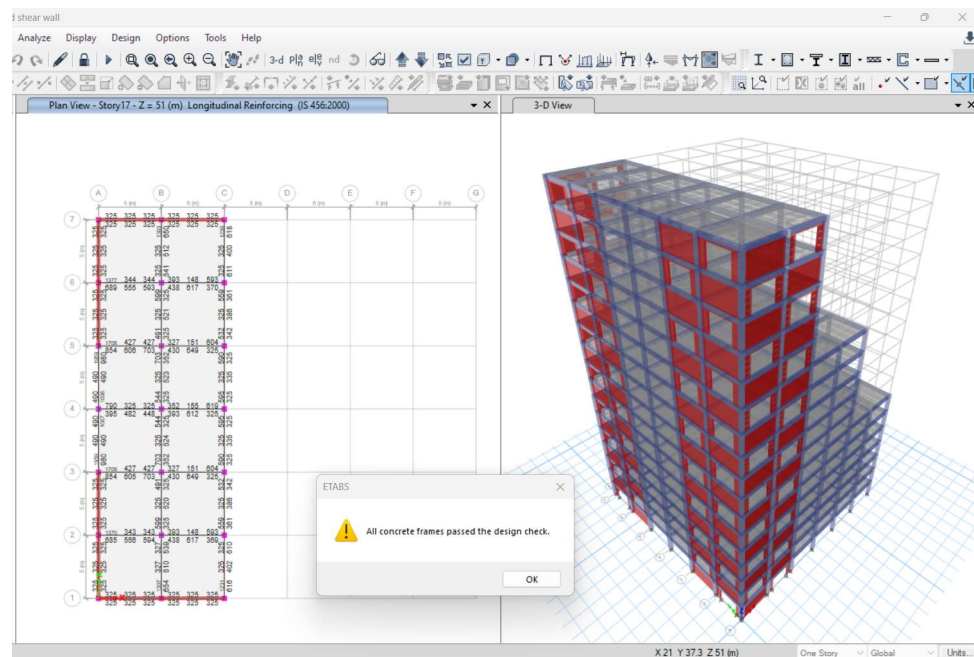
Plan and 3D view of Model VII (VIWSSWO).
